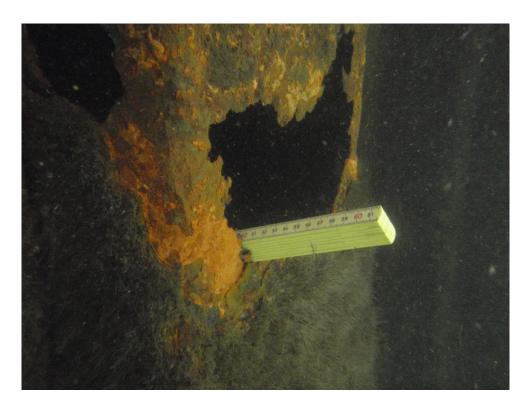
Corrosion damages on a sheet pile wall under the water line. The filling behind the wall has been washed away and the remaining service life of this wall should be considered as zero.
